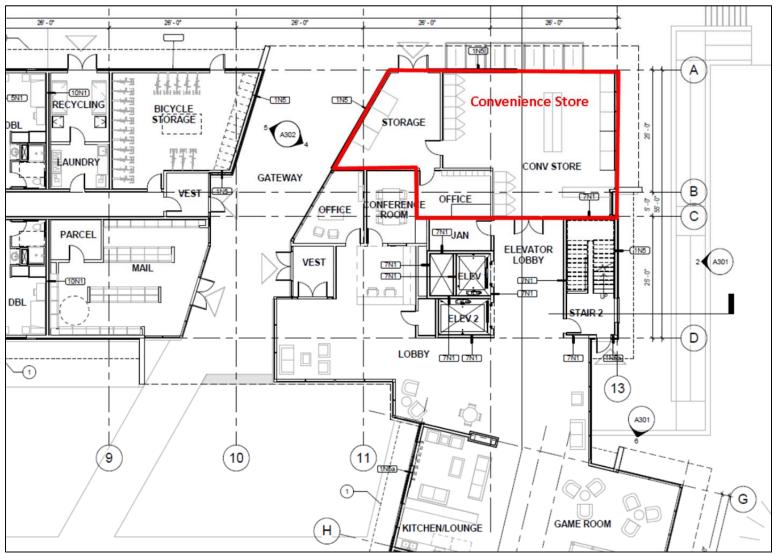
First Floor Plan Detail – Residence Hall
